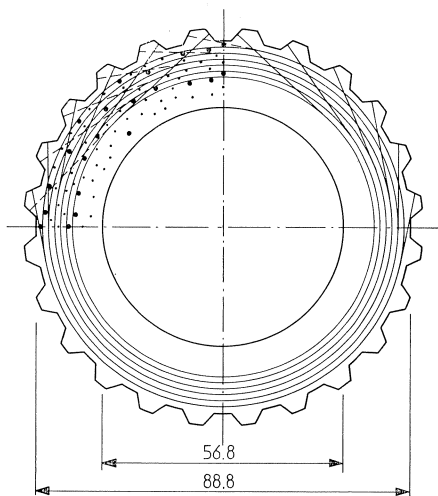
Horizontal section through cylindrical wall of pressure vessel: prestressing steel.
